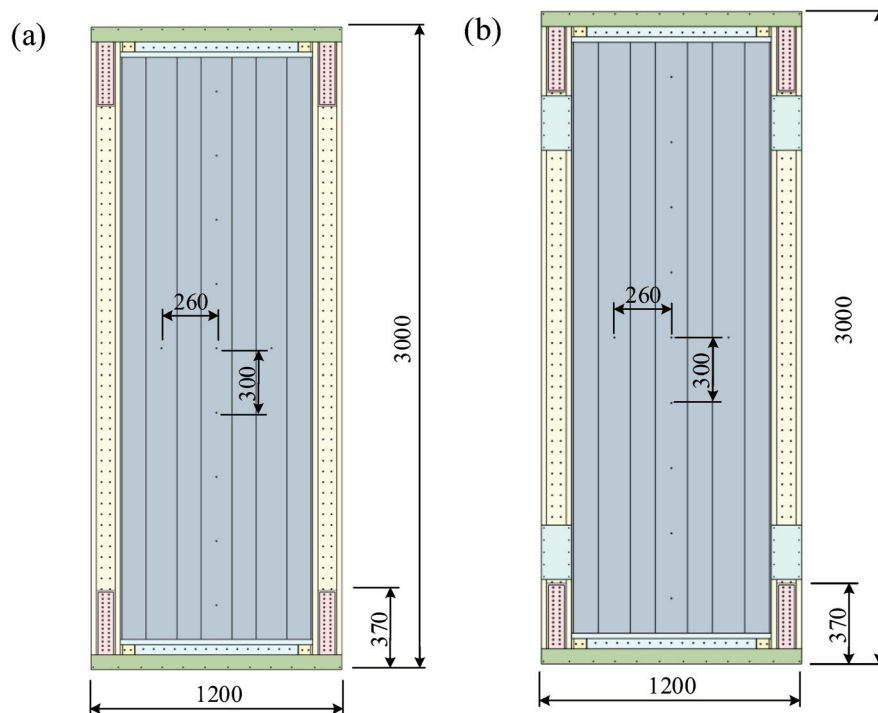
Configurations of specimens: (a) specimen SW-1; (b) specimen SW-2 (unit: mm).
